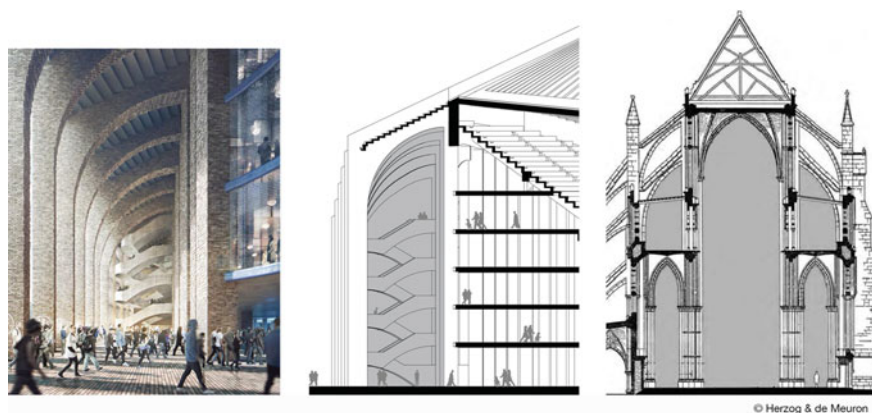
South-east entrance lobby; west entrance lobby-section; Westminster Abbey-section, Herzog de Meuron (2015), *Stamford Bridge Grounds. Detailed Plan Application. Design and Access Statement*, [4, pp. 131 and 130]
